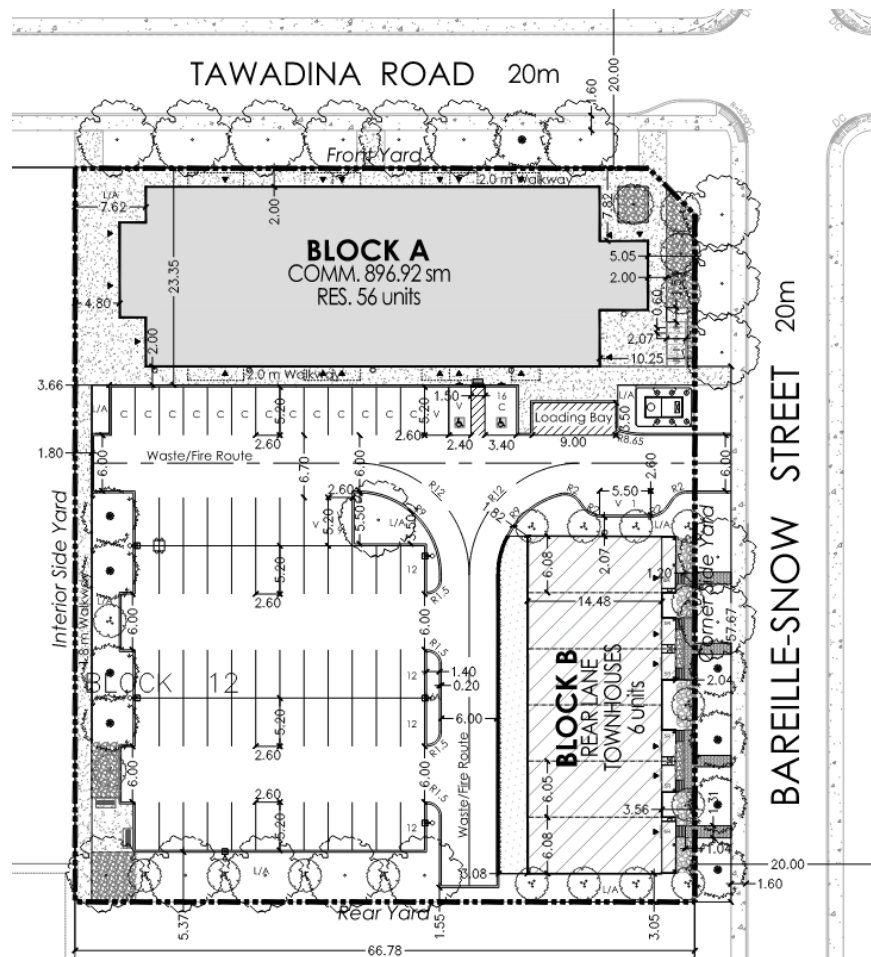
Site Plan (Korsiak, dated June 25, 2026)
